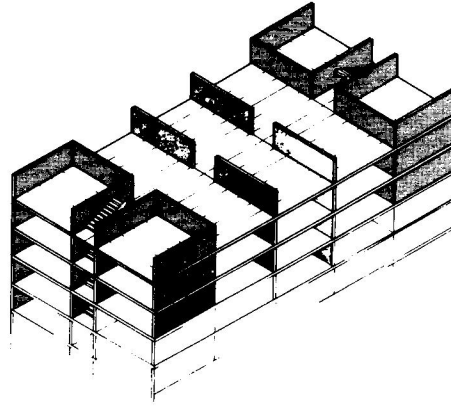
Large Panel Precast Concrete Building Typical of American and Canadian Construction
